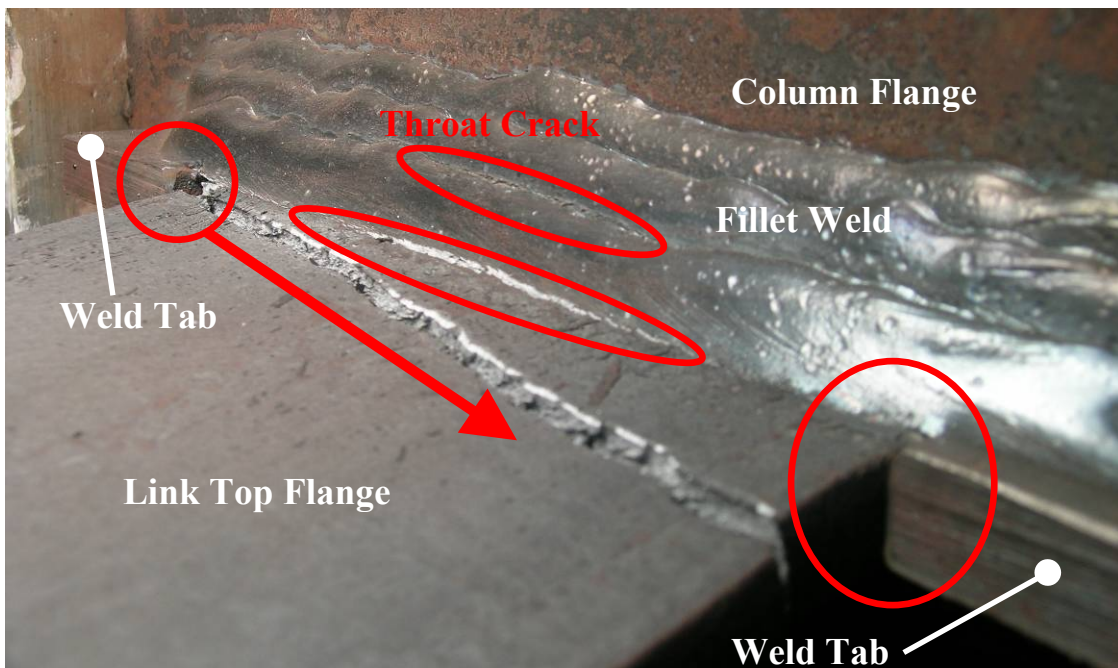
Link Flange Fracture in Specimen AISC-2
